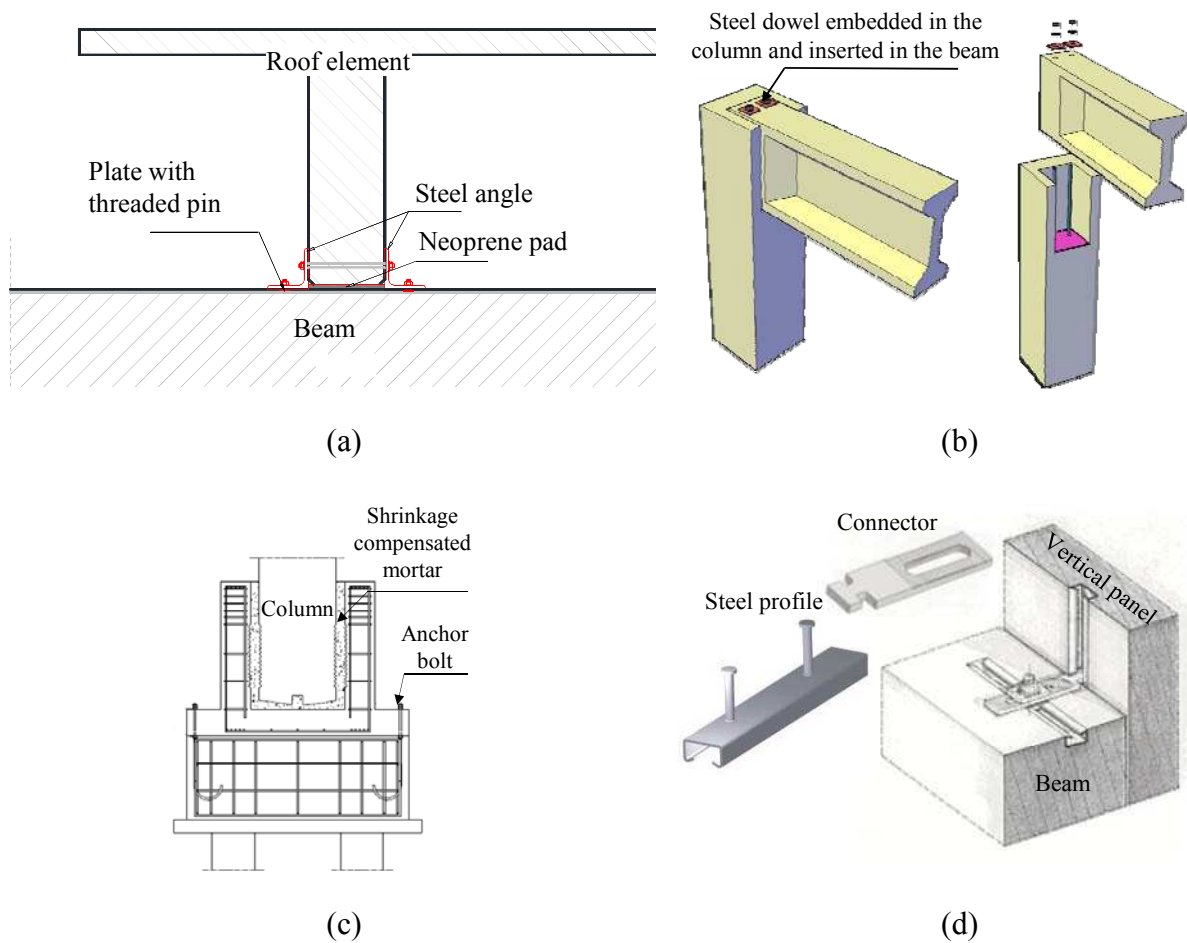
Examples of connections in precast structures: (a) pin roof element-to-beam connection; (b) dowel beam-to-column connection; (c) socket column-to-foundation connection; (d) vertical panel-to-beam connection.
